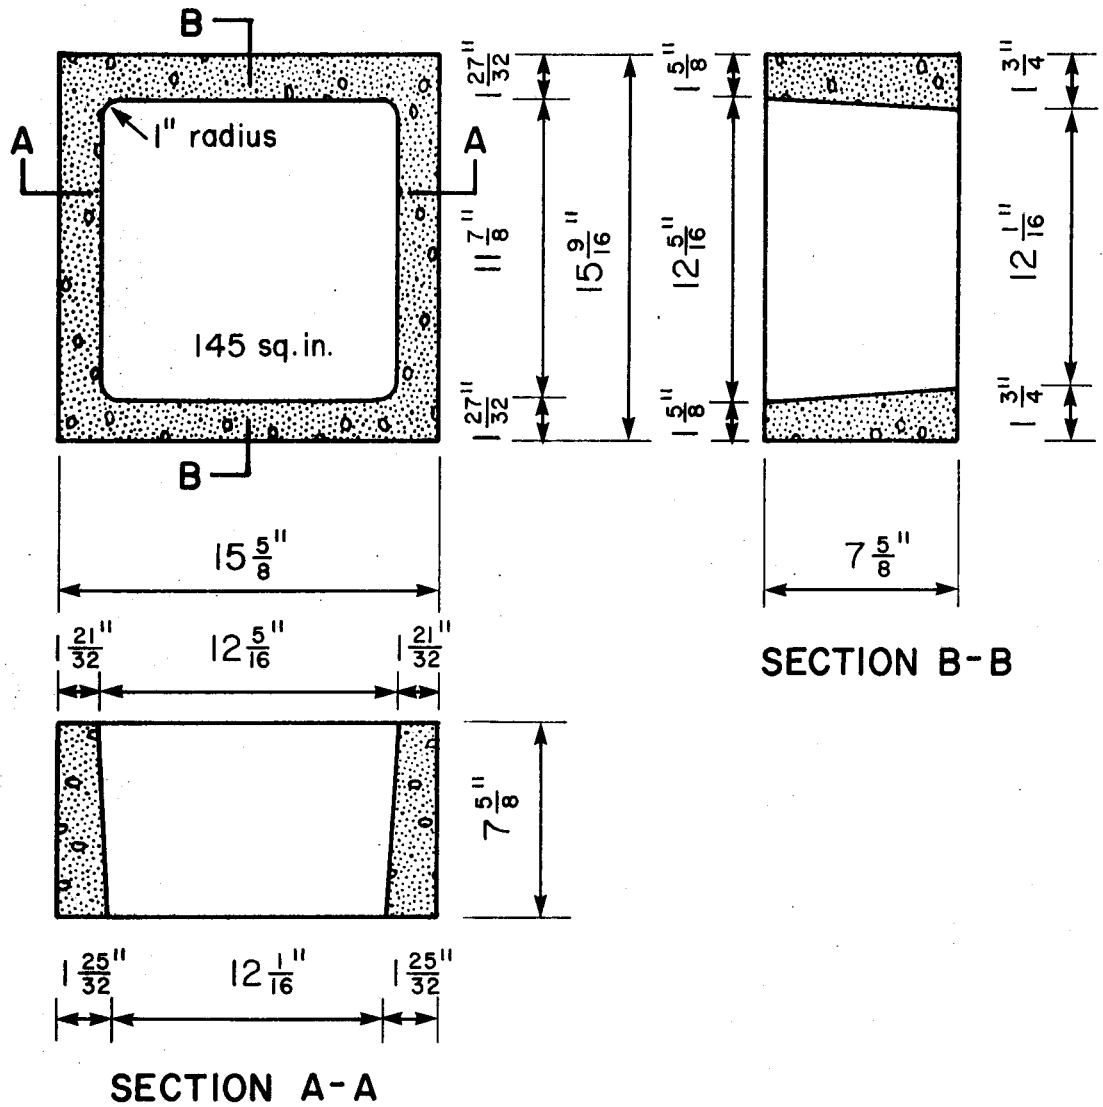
Dimensions of Single Core Pilaster Concrete Block Units Used in the Study
